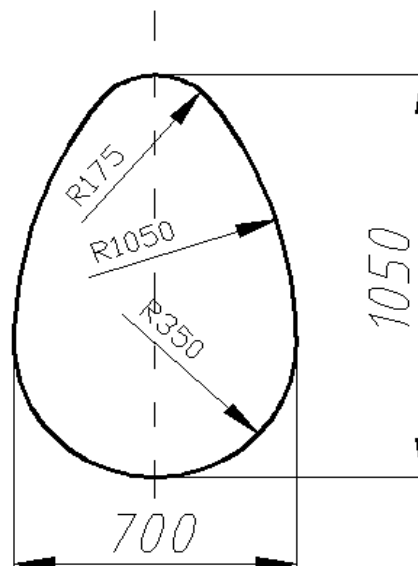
Internal dimensions (in mm) of the conduit's cross section.
